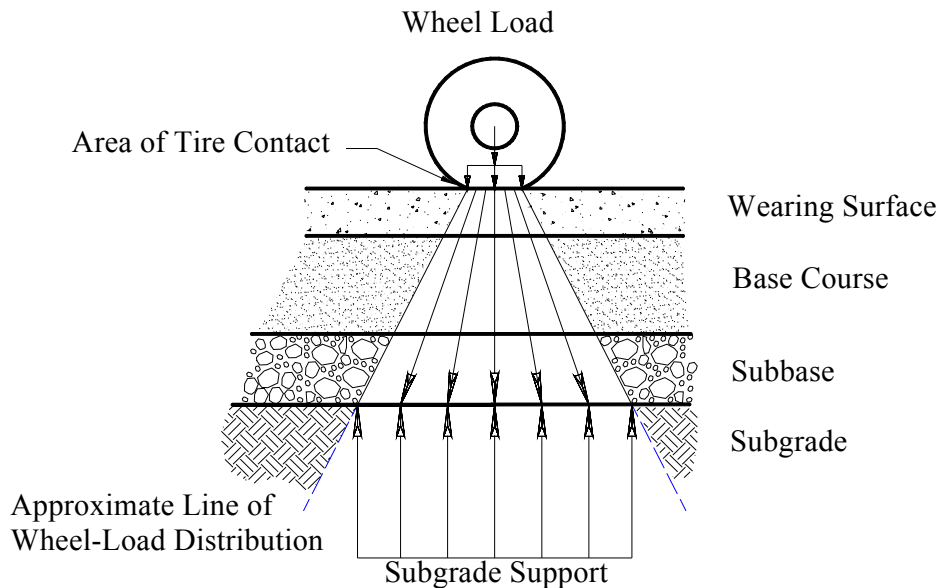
DISTRIBUTION OF LOAD STRESS IN FLEXIBLE PAVEMENT.
